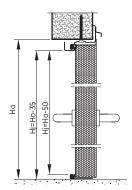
Installation of a single-leaf door with a corner frame without a thermal break to a steel structure – vertical cross-section
